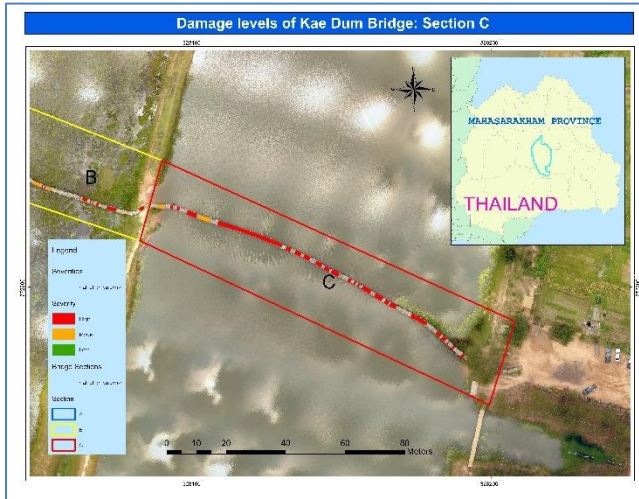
Damaged levels of Kae Dum wooden bridge: Section C
